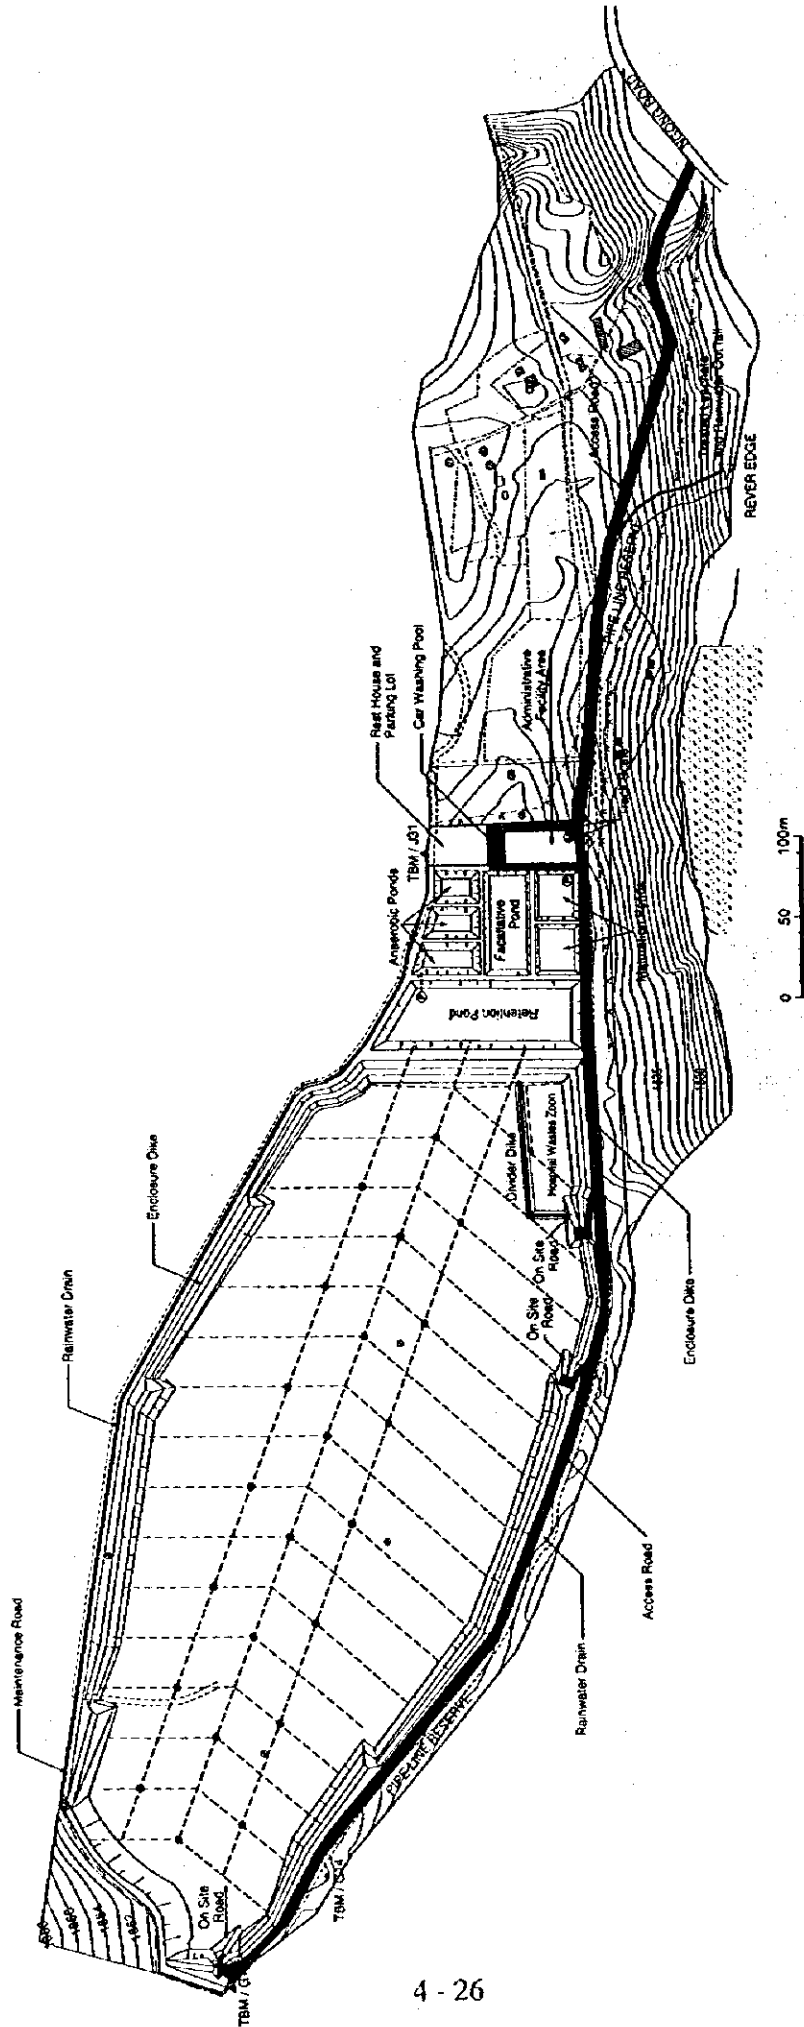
Plan of Ngong Road Forest Landfill Site
